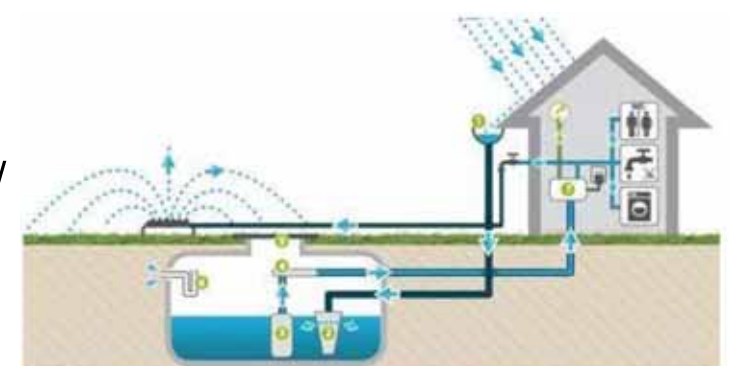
Diagram illustrating rainwater harvesting systems that could be integrated into open space and residential developments.
